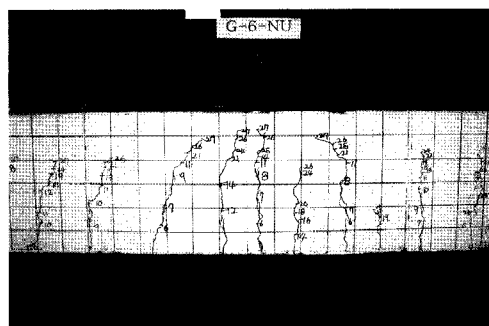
Concrete Cracks and Debonding Failure (NU Beam)
